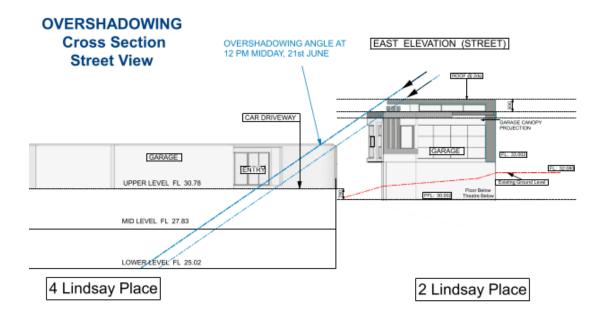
Cross section view showing overshadow onto No.4 Lindsay Place on LHS will predominantly be on its roof and driveway
